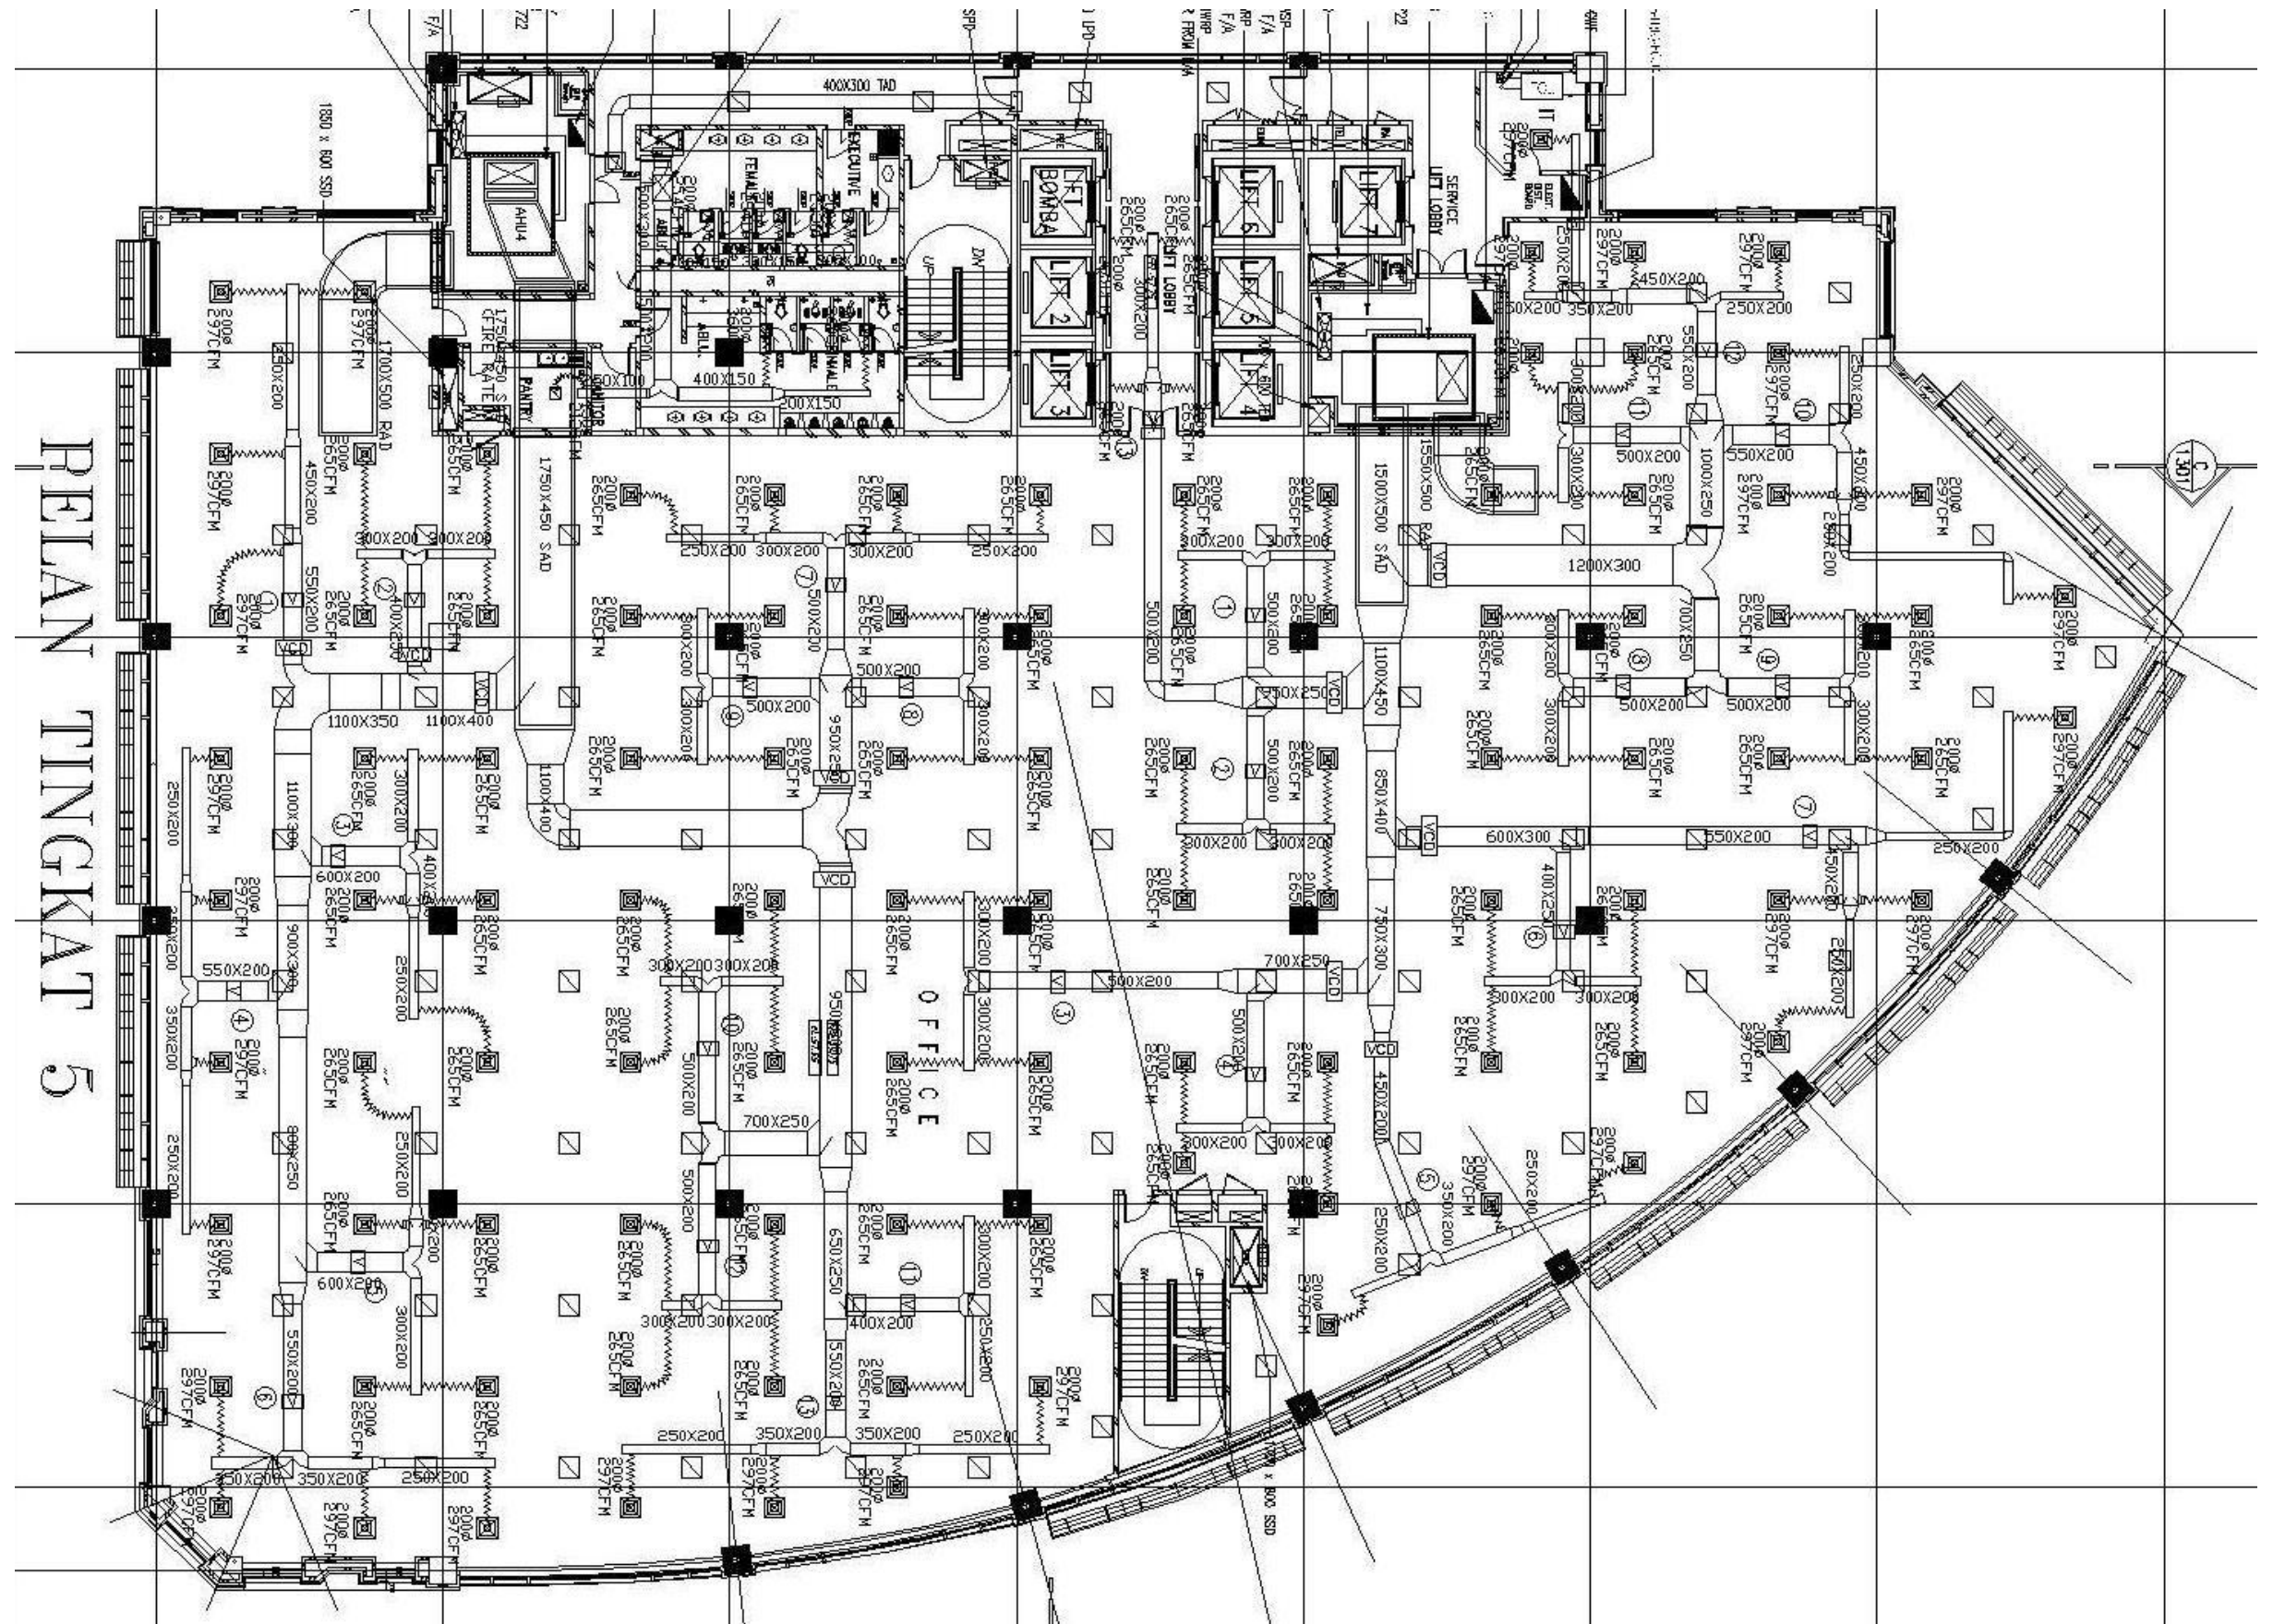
The floor plan of Level 5, North Tower, Menara Sri Wilayah
